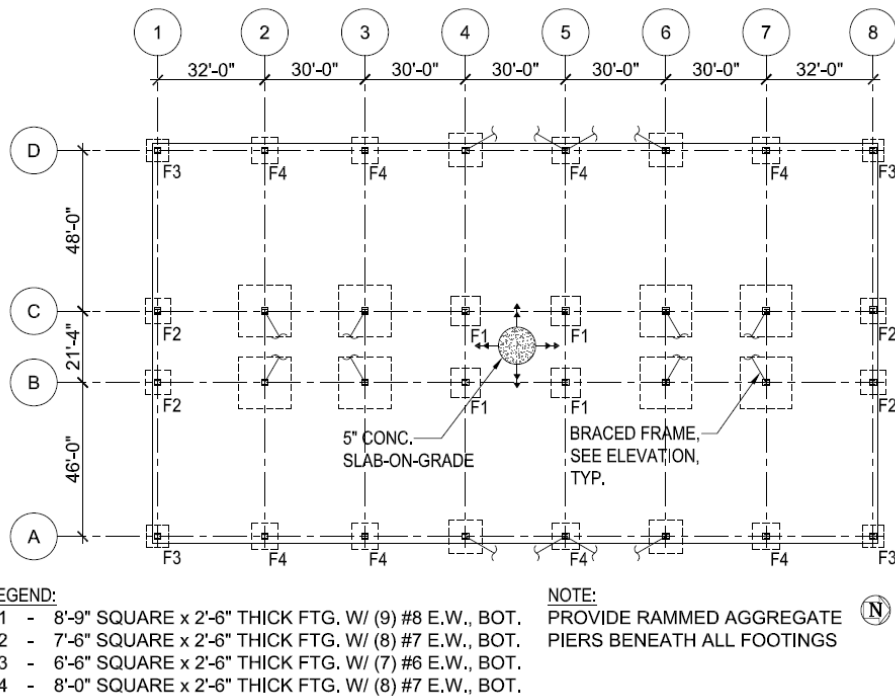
Office building foundation plan showing brace layout for current local seismic code design.
